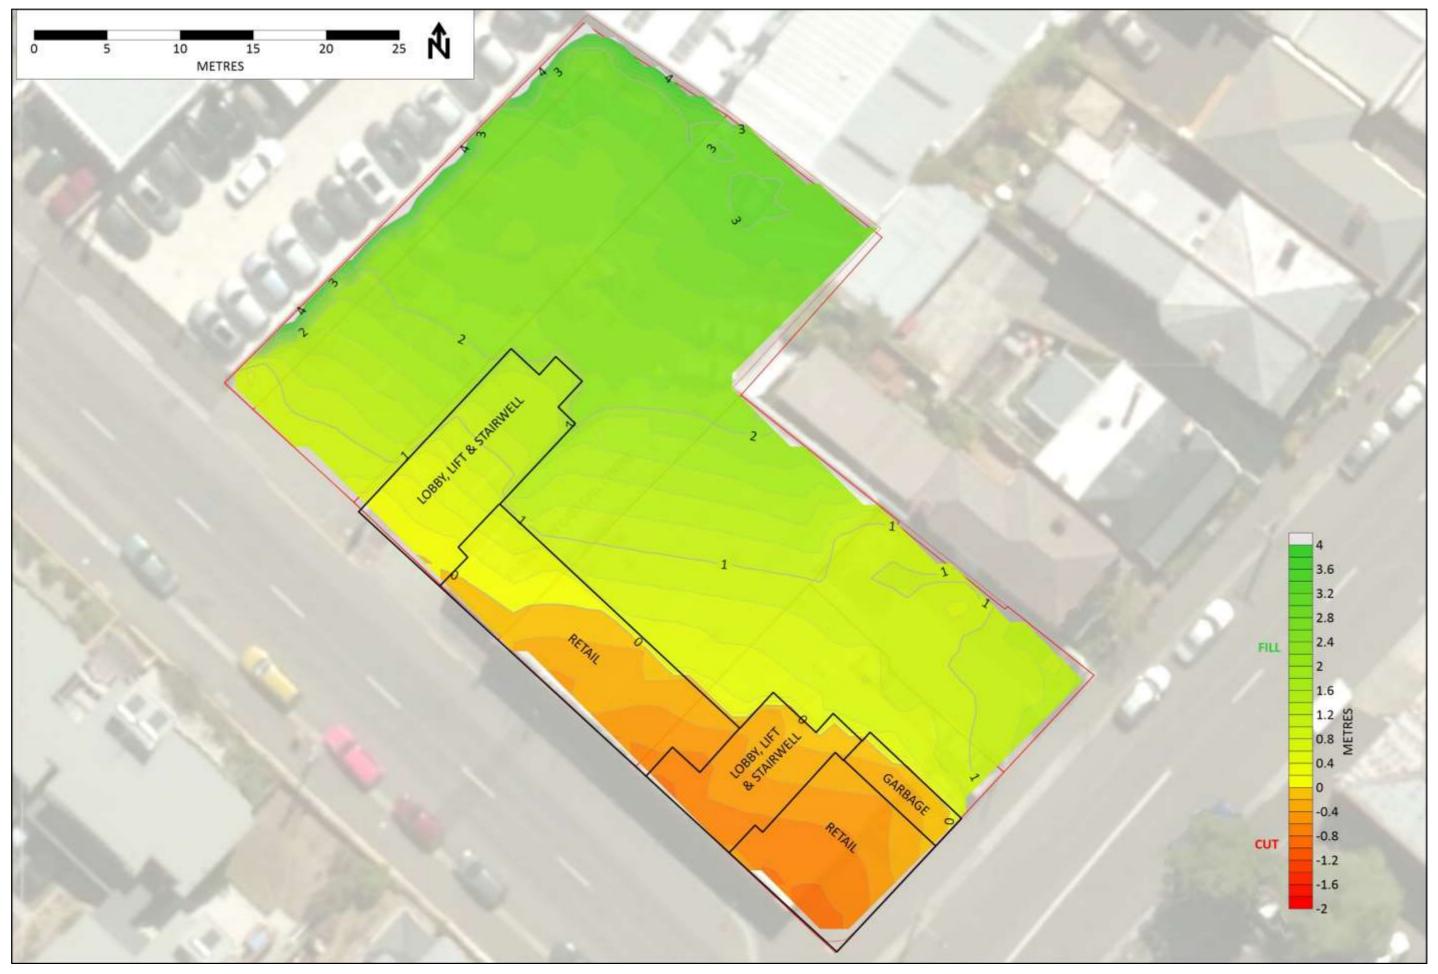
Proposed Site Development Ground Floor Layout with Proposed Excavation and Filling Relative to Current (2013 Mt Wellington LIDAR) Level
